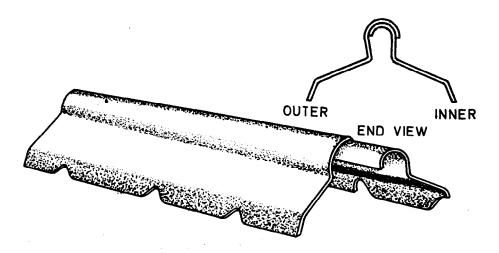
TYPICAL SEMI-CORRUGATED SERRATED ADJUSTABLE RIDGE
